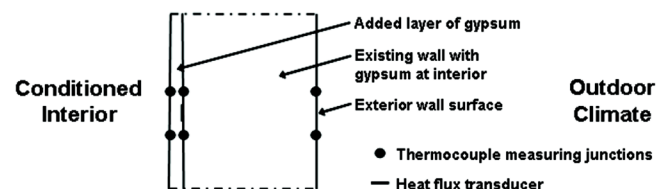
Arrangement of instrumentation and added gypsum layer to comprise test sections.
